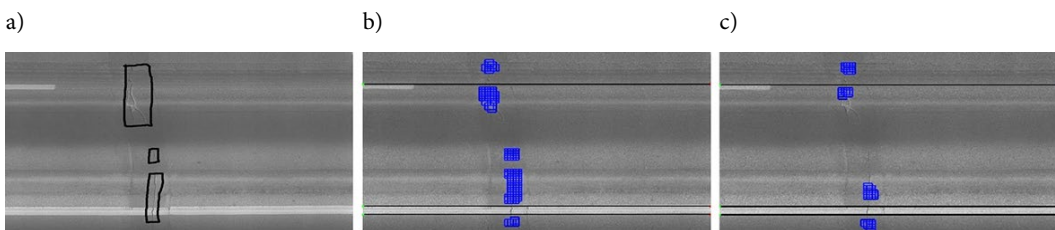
An example of high severity asphalt pavement crack detection: a – actual image; b – shape-based crack detection; c – SVM based crack detection
